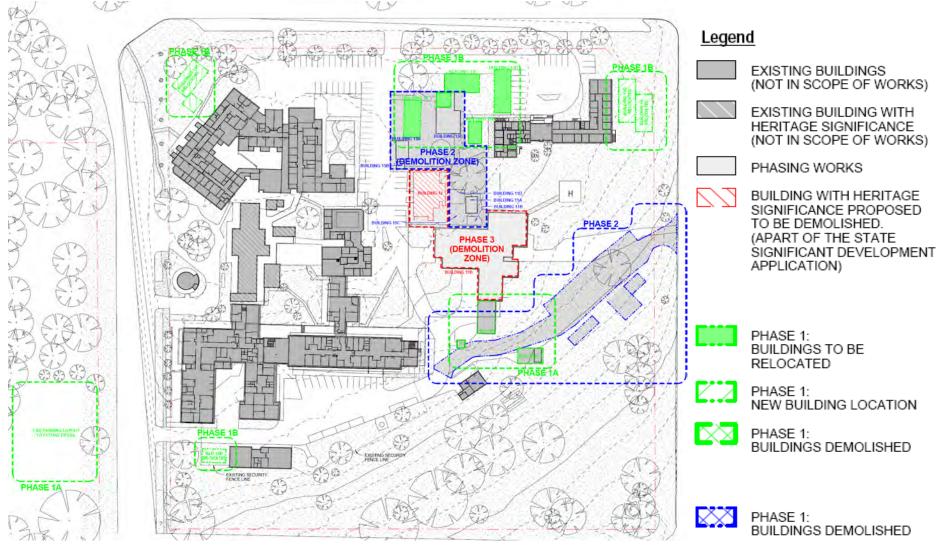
Kempsey Hospital – Proposed Site Plan - Source – BVN Donovan Hill – Architects
